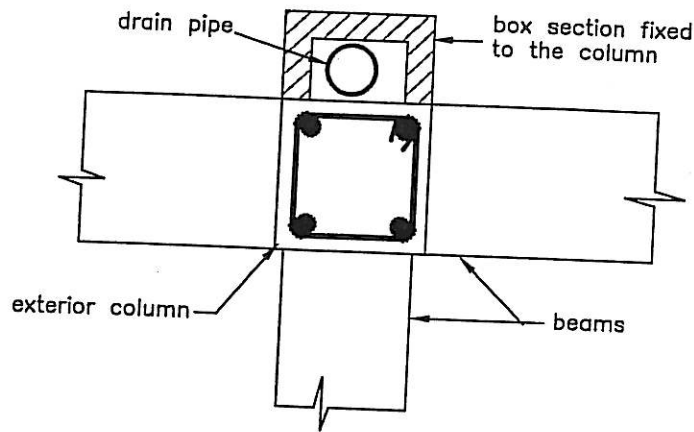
Rain water pipe hidden in a hollow box section outside column's section (attached to column)
